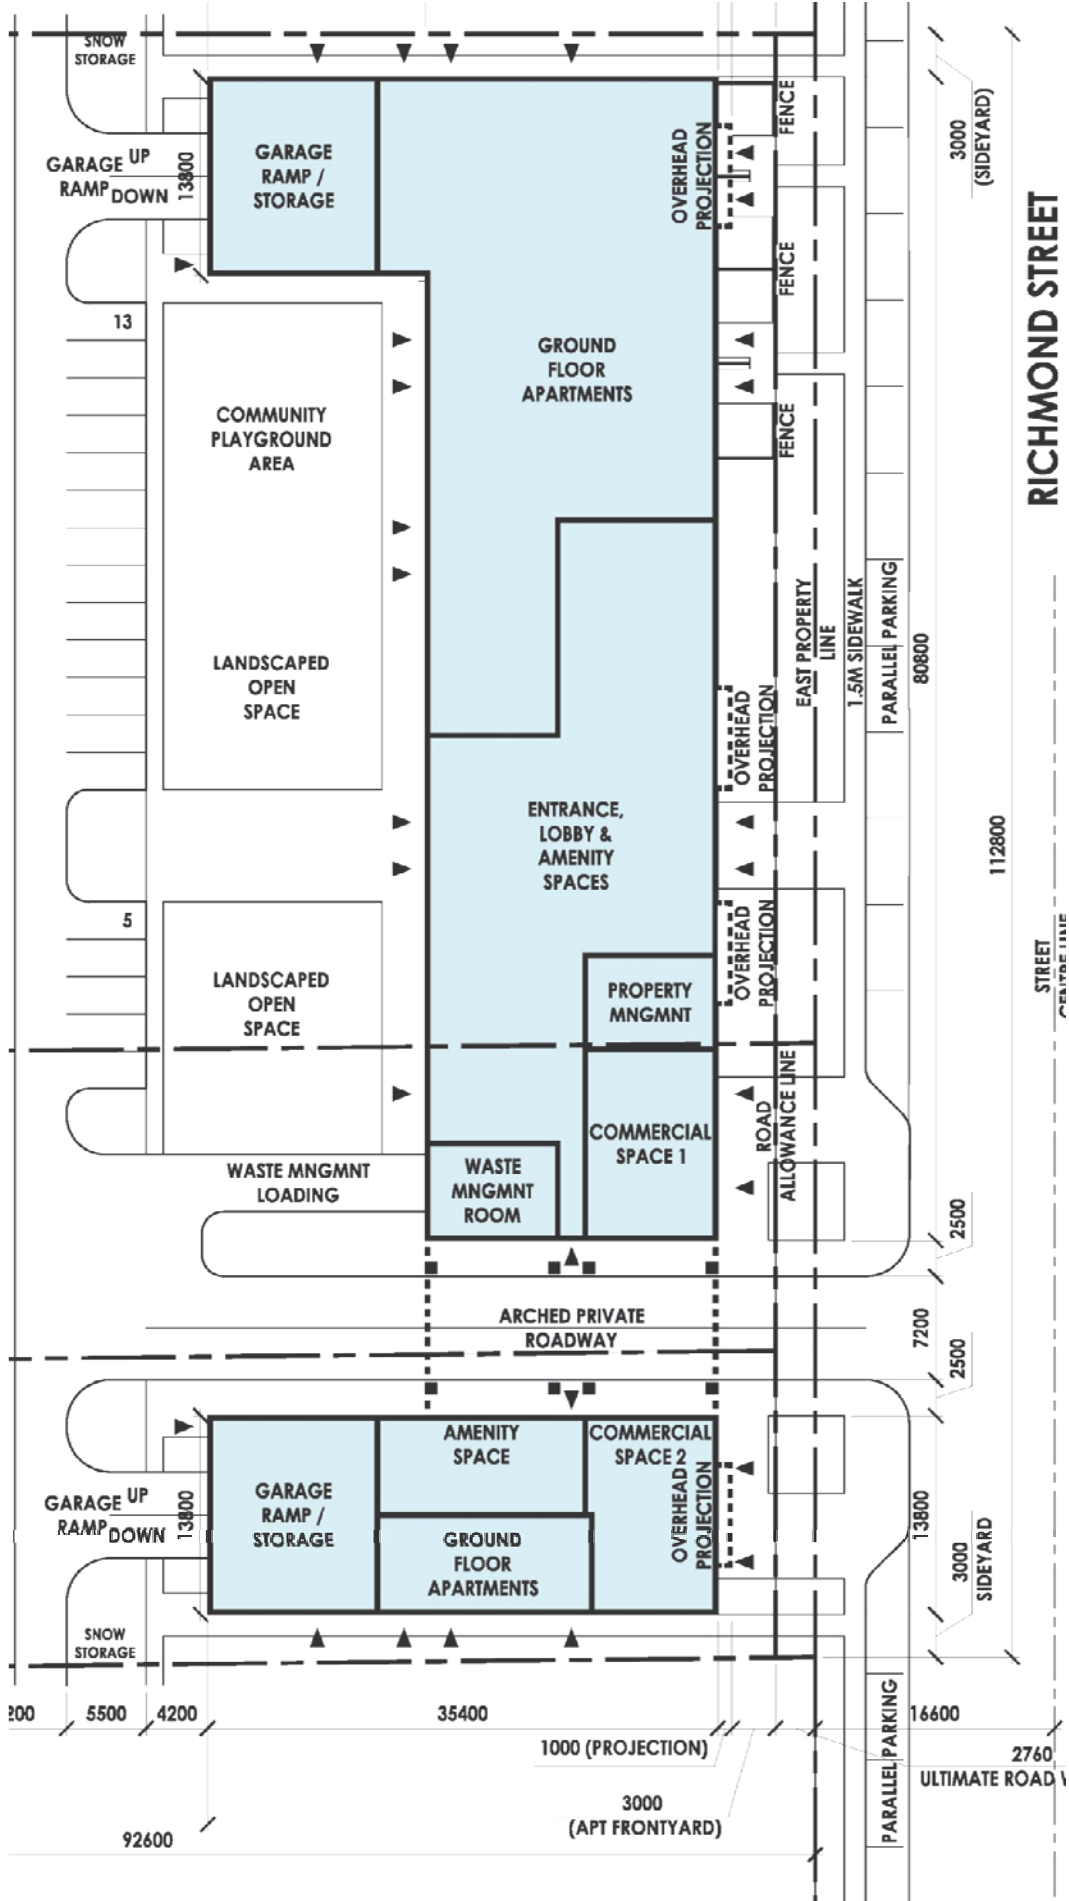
illustrating the footprint of the proposed apartment building on the properties at 1631, 1635, and 1635 Richmond Street
